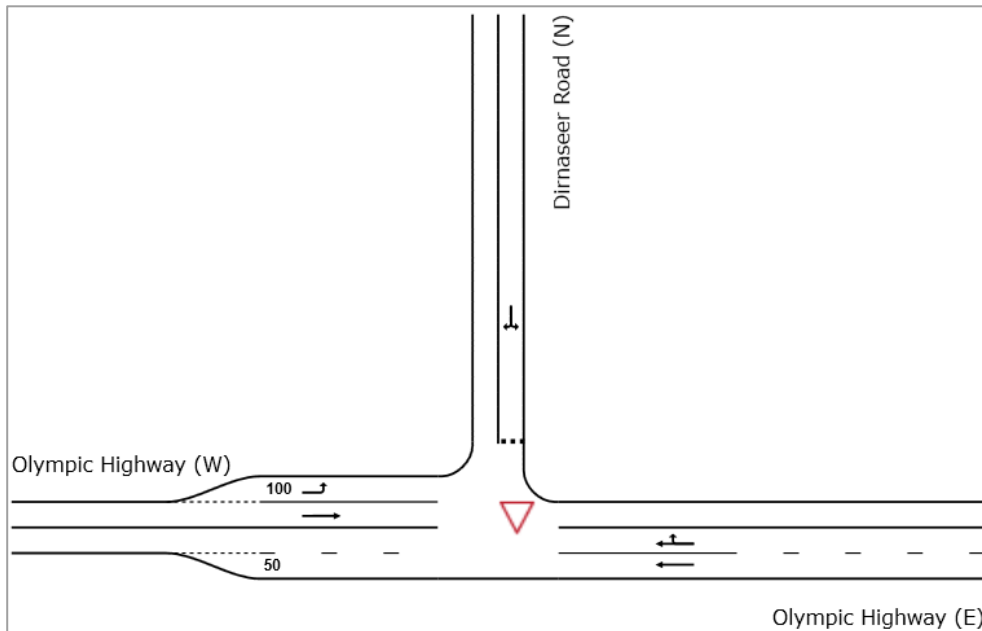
Olympic Highway/Dirnaseer Road – SIDRA layout
